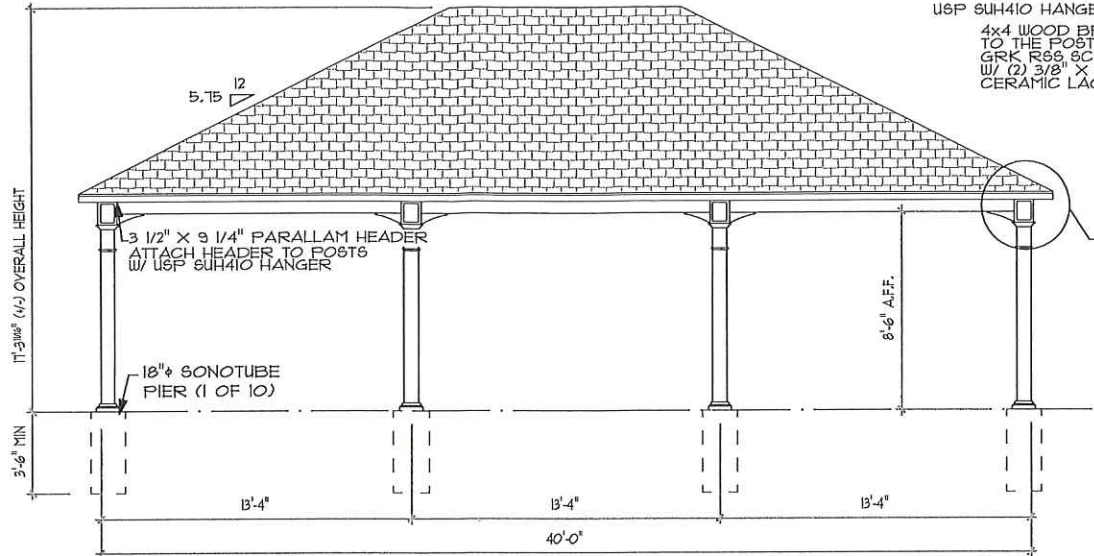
DETAILS DEPICTING COMMUNITY CENTER PAVILLION LOCATED AT RIVERFRONT COMMUNITY CENTER 300 WELLES STREET GLASTONBURY, CONNECTICUT
